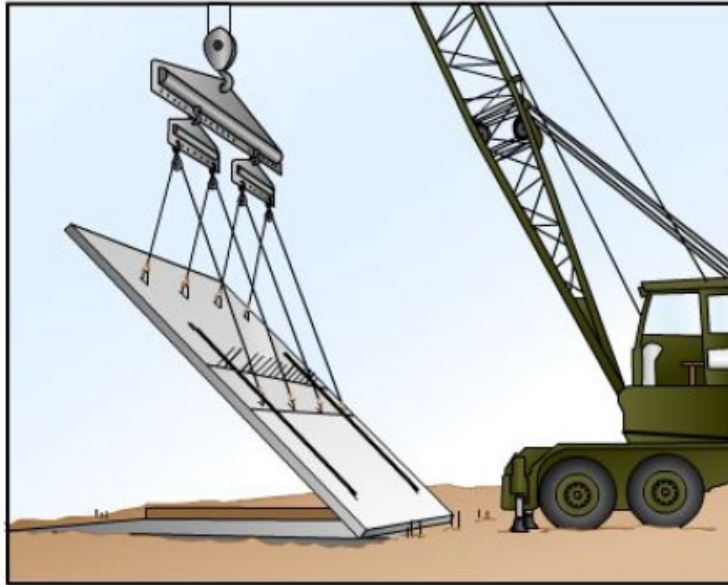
Precast panels being erected by use of crane and spreader bars.
